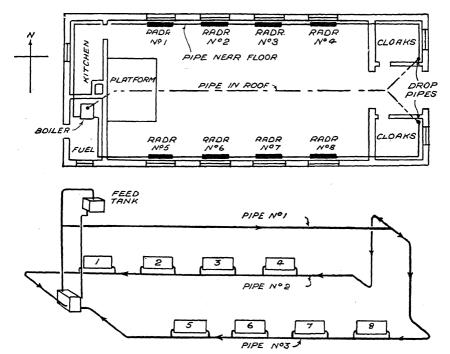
Typical single-pipe heating system for a recreation room or small entertainment hall, using pipes and radiators served by a boiler 18 in. below floor level
